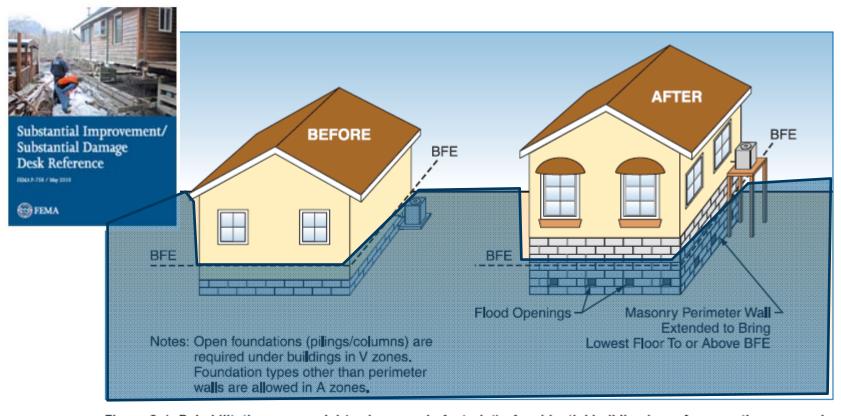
Rehabilitation or remodel (no increase in footprint) of residential building in an A zone – the proposed work was determined to be a substantial improvement. The building is brought into compliance by elevating it on an extended perimeter foundation wall, installing flood openings, and raising the HVAC equipment onto a platform.
